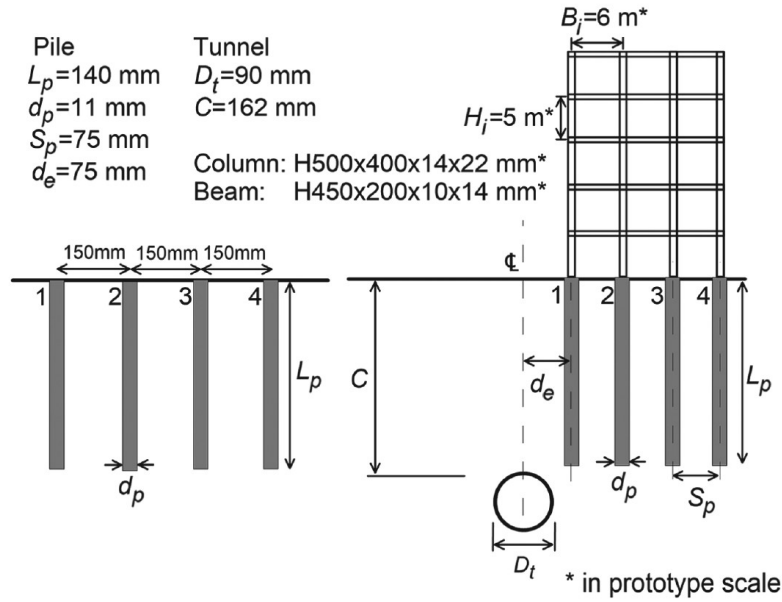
Tunnel-pile interaction test configuration: jacking (left) and tunnelling (right) (Song and Marshall, 2020)
